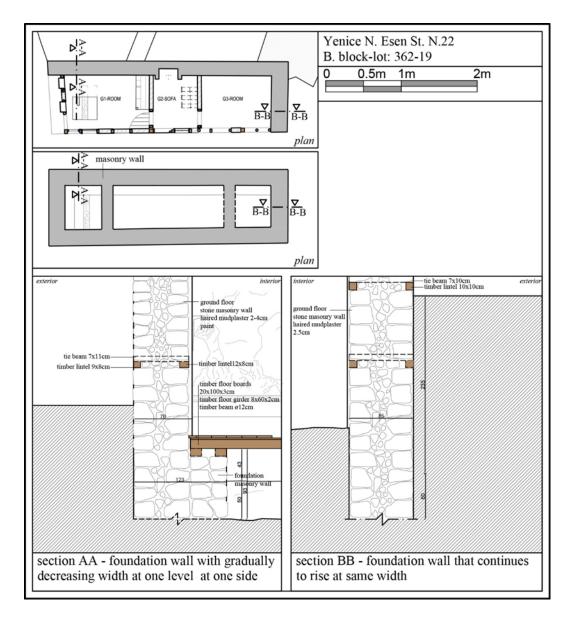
Drawing of continuous foundation (Yenice N. b.blok-lot: 362-19)
